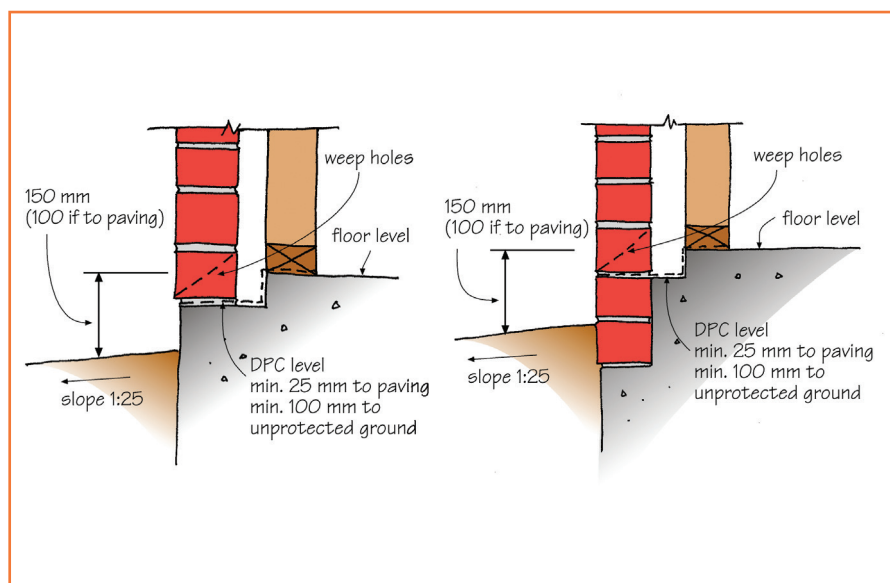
Concrete brick above ground on slab with rebate and DPC.
